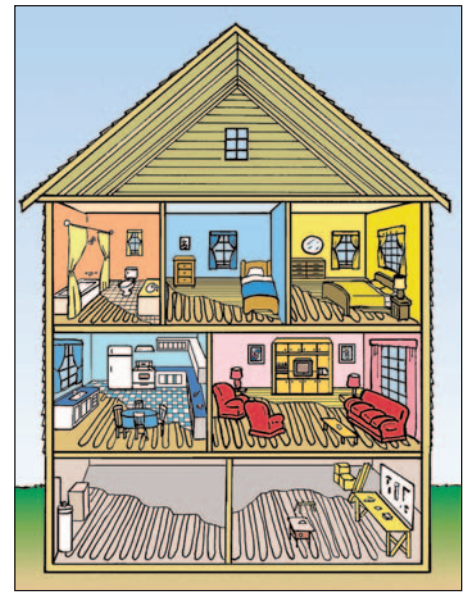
Hydronic radiant floor heating throughout a home. Note: Pipes are not visible when installation is completed.
